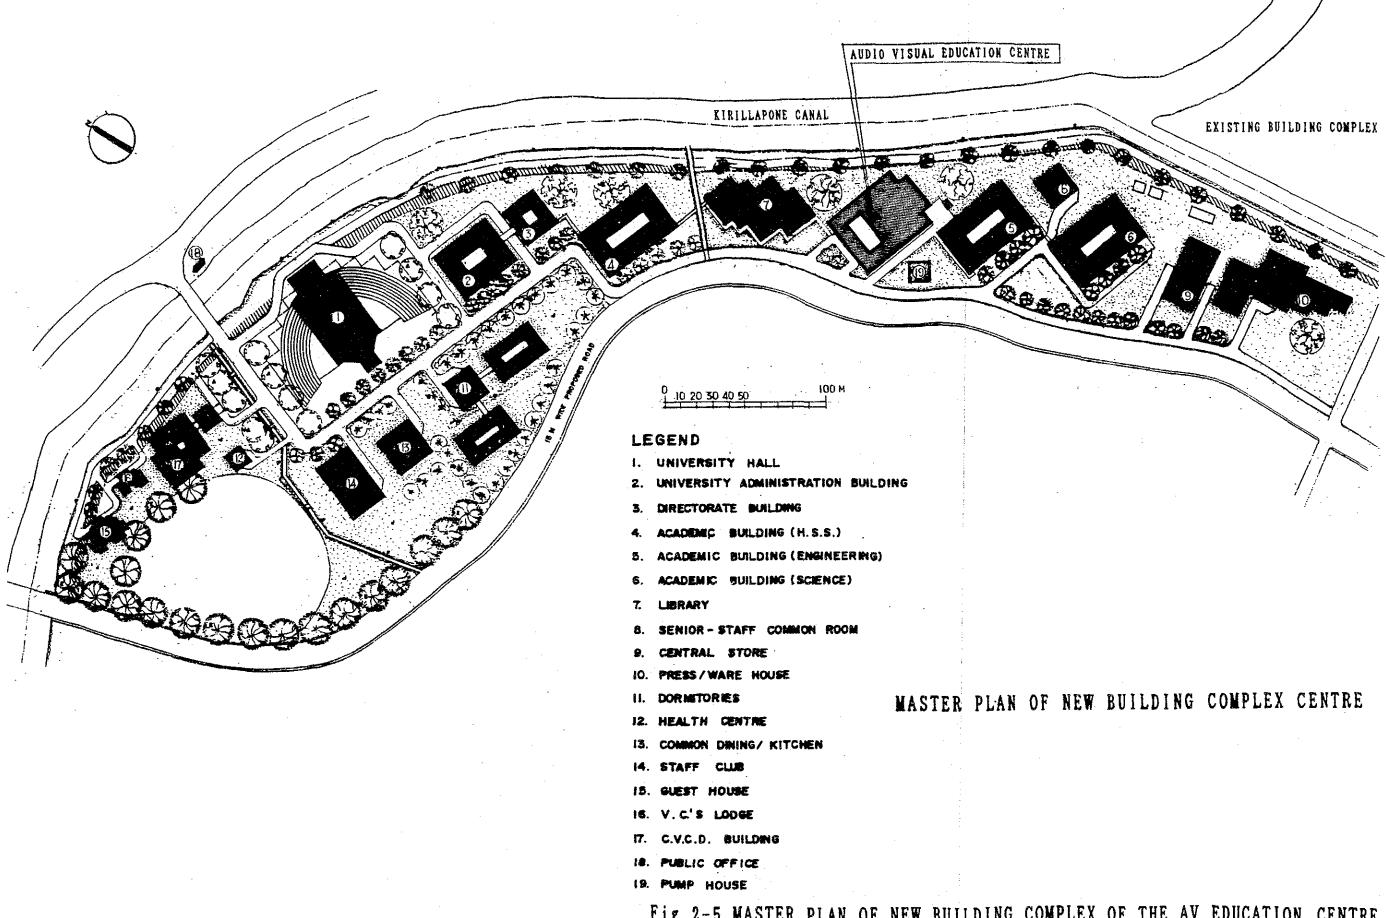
MASTER PLAN OF NEW BUILDING COMPLEX OF THE AV EDUCATION CENTRE
